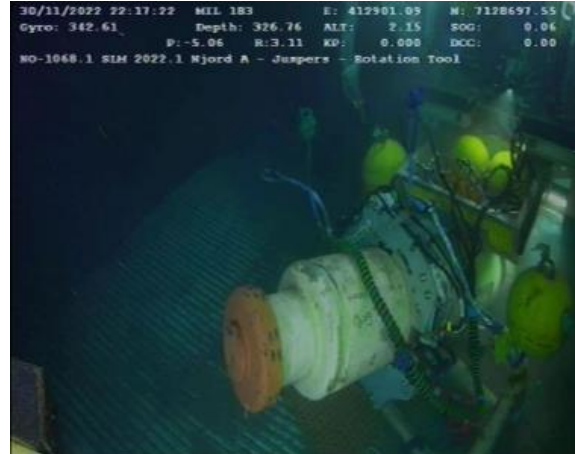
Jumper 14C Well End Rotation Attempt using Manip
